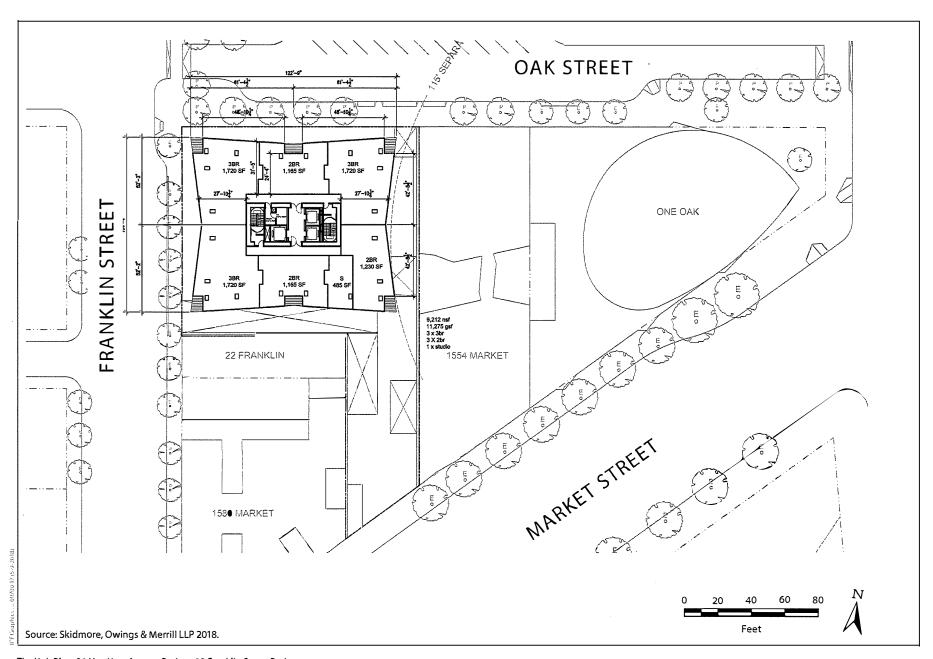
98 Franklin Street Project – Proposed Upper Tower Floor Plan
